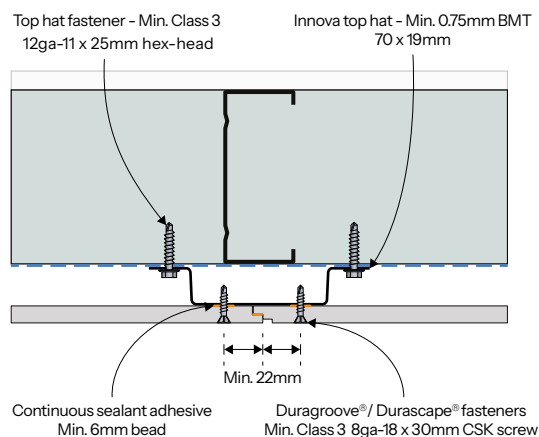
Steel frame - cavity fix (19mm) fastener detail Plan
